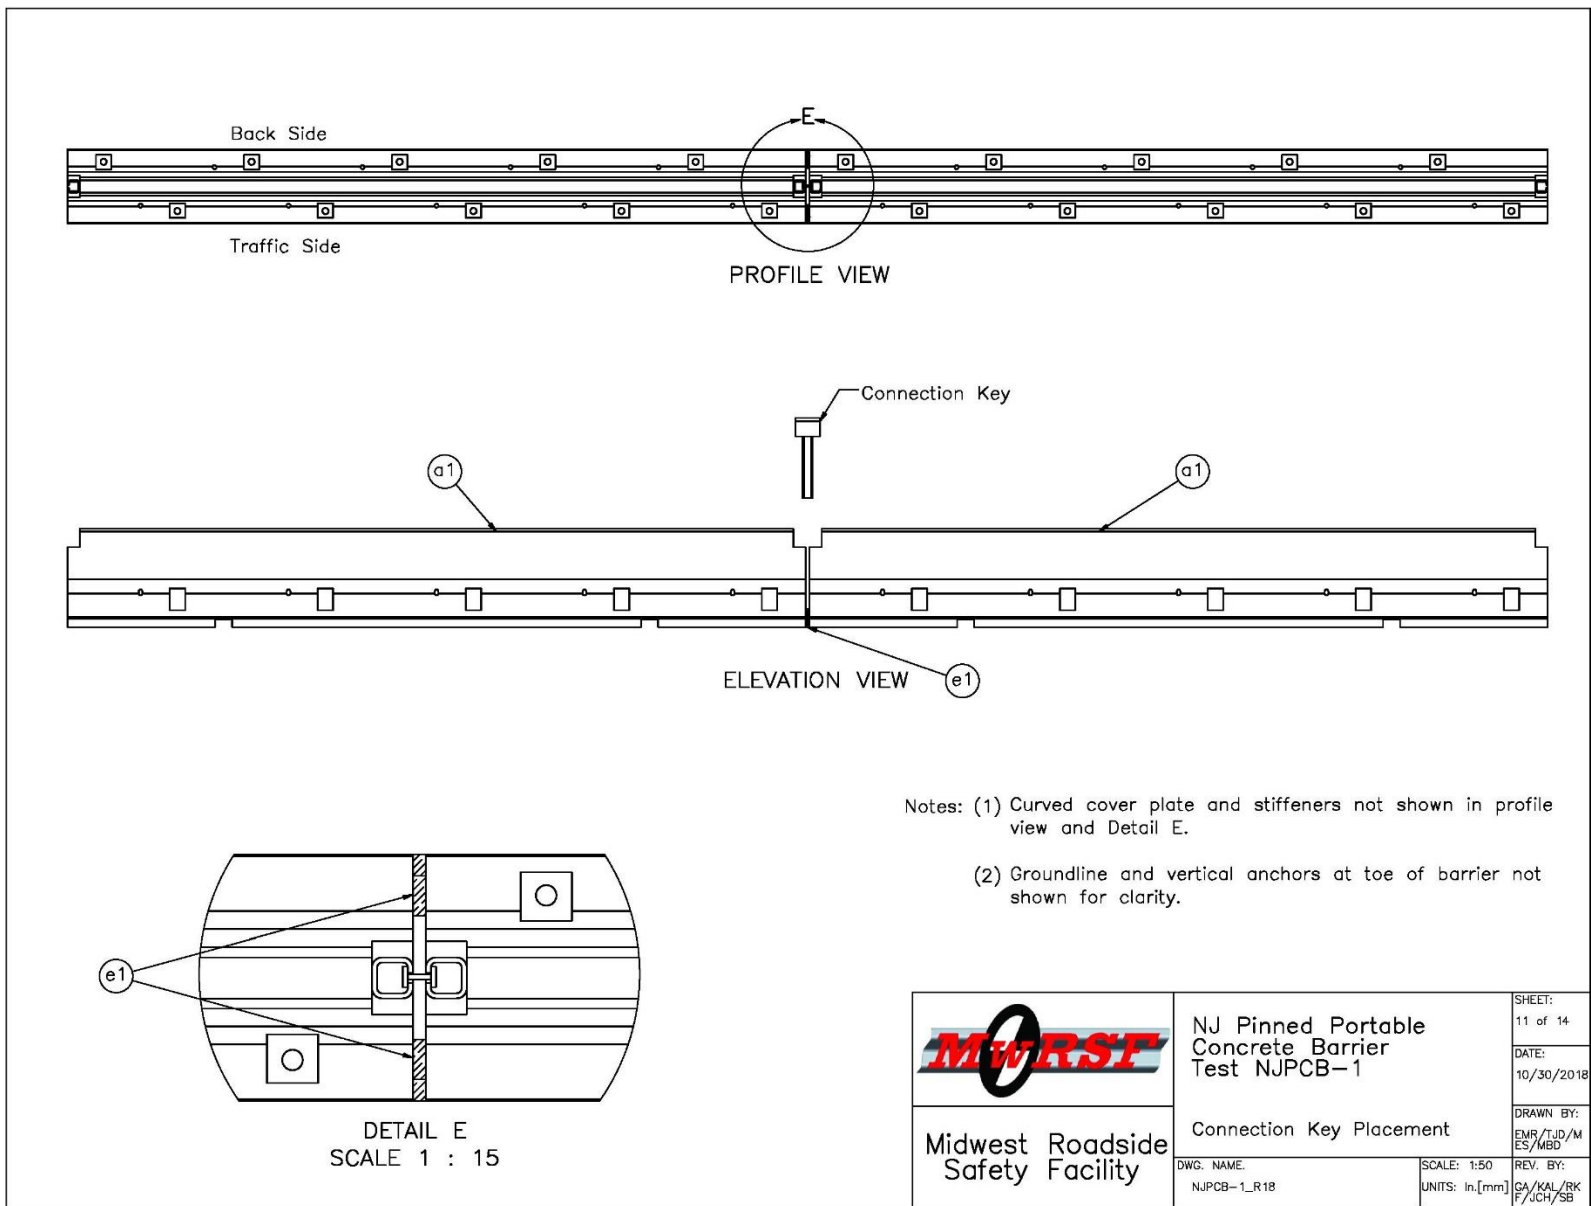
Connection Key Placement Details, Test No. NJPCB-1
